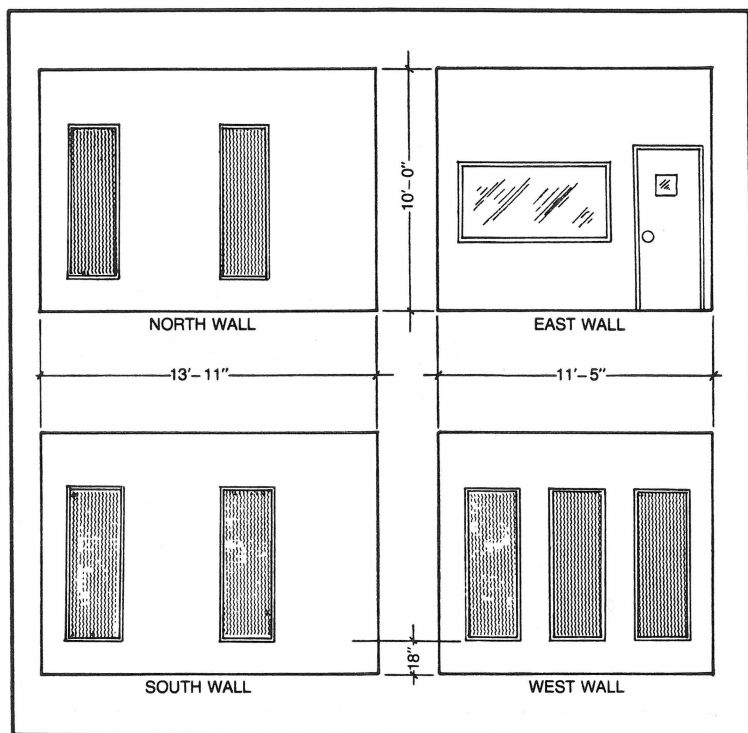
Studio wall elevations showing location of wideband modules.
